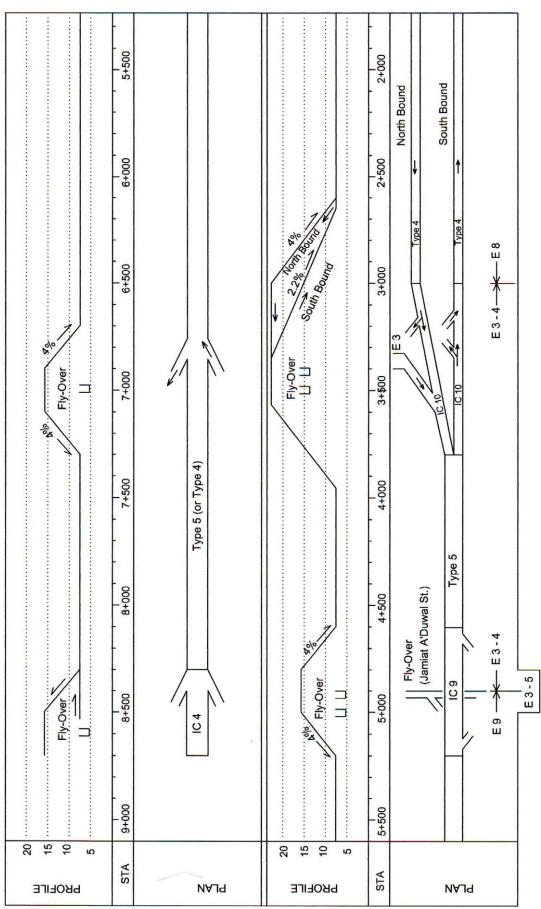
(1/2) Plan and Profile : E9 / E 3-4 / E8
